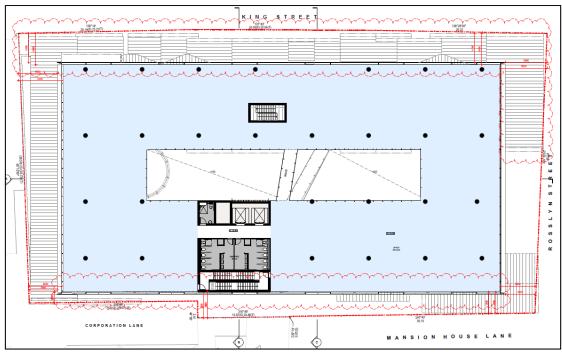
Level 2 Floor Plan (Drawing No. TP01.08)
